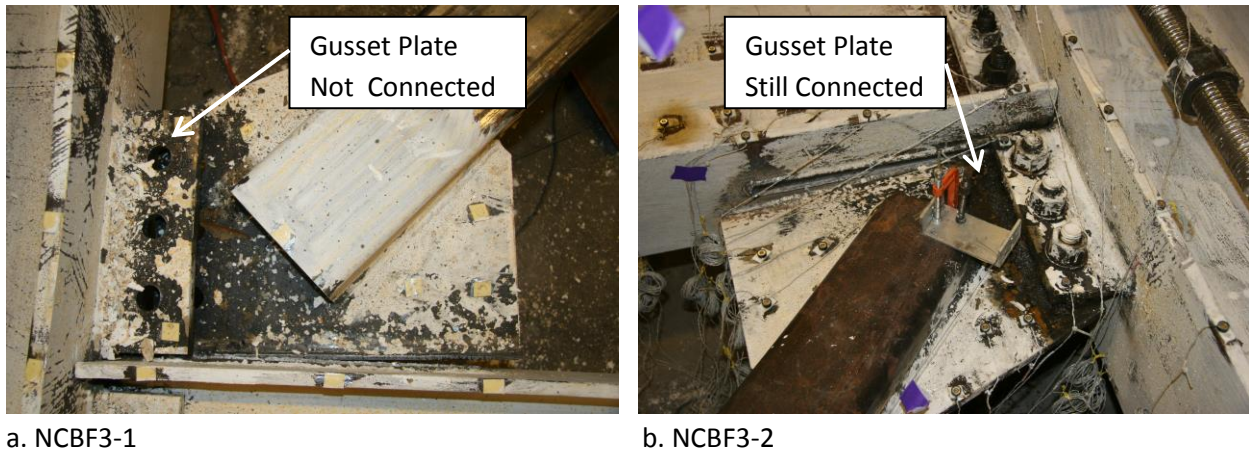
Split Shear Plate Connections After Weld Fracture
